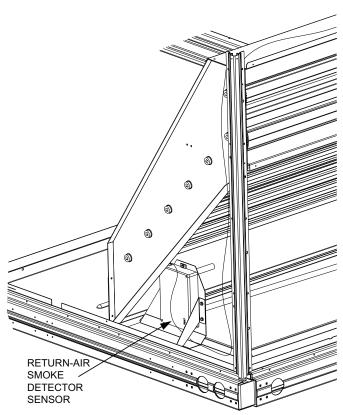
Return-Air Sampling Tube Location in Unit with Economizer
